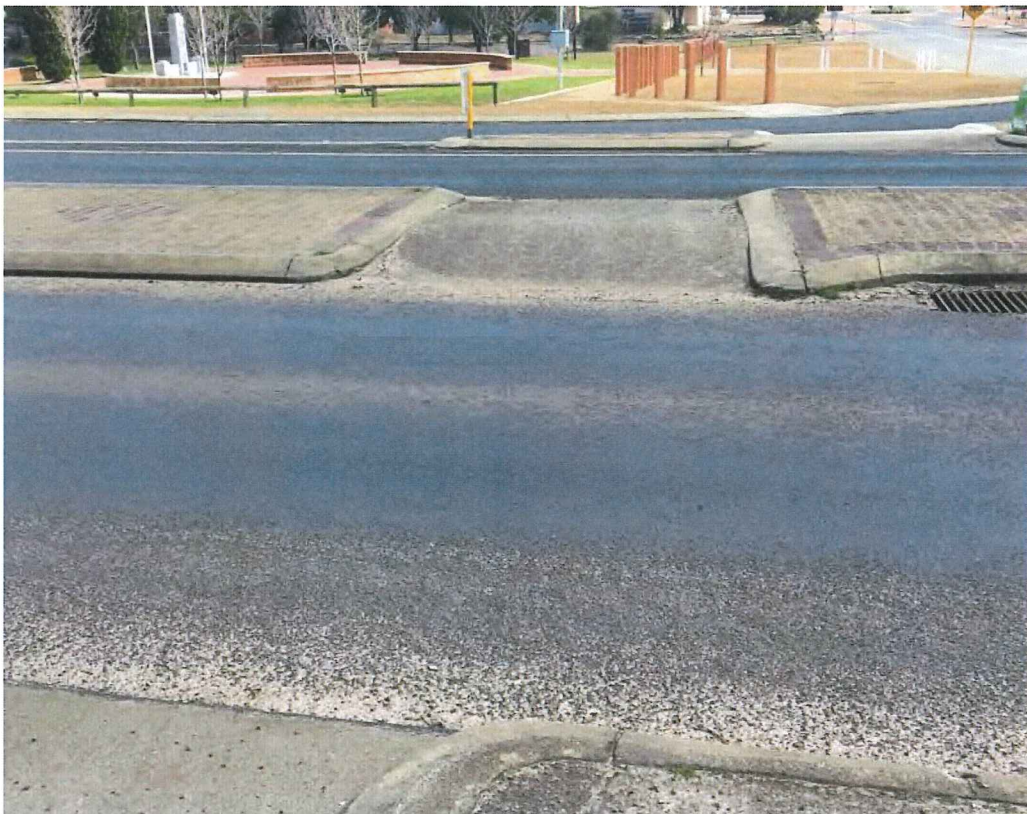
Muir Street. Pram ramps, centre median refuge and left turn pocket refuge
